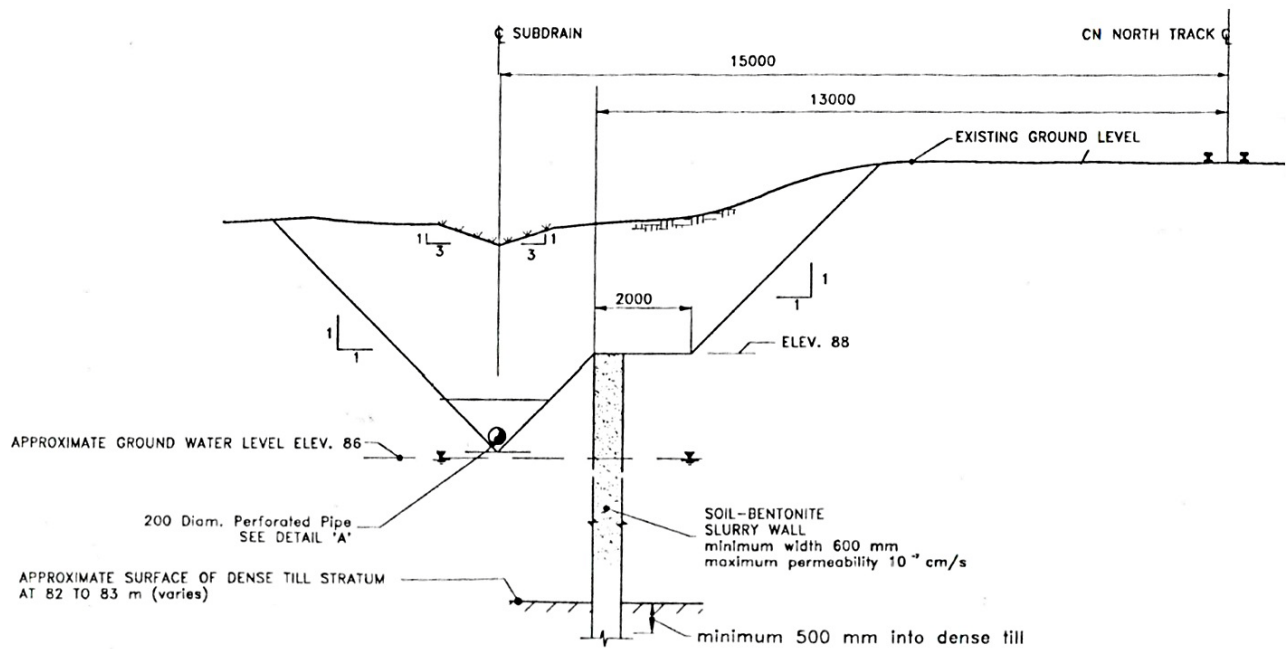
Trenching Detail for Slurry Wall and Subdrain Installation
